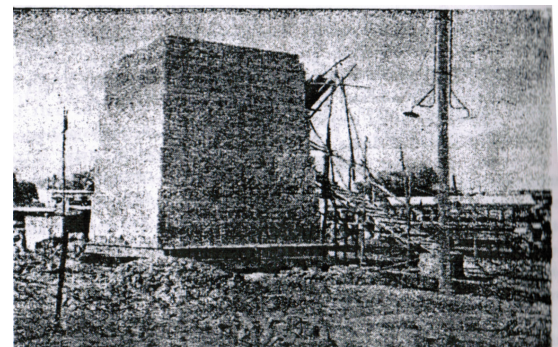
Photo plate showing loading test on a prototype footing at ISBT, Delhi (Desai, 1970).
